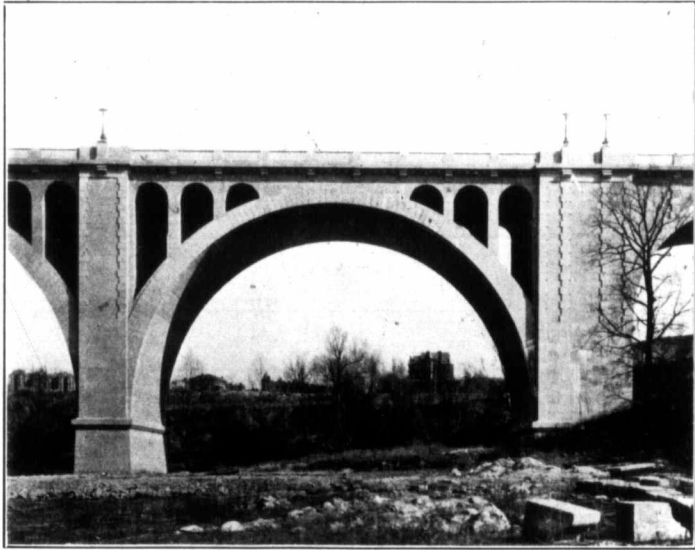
One Span of Connecticut Avenue Bridge, Washington, D.C.
